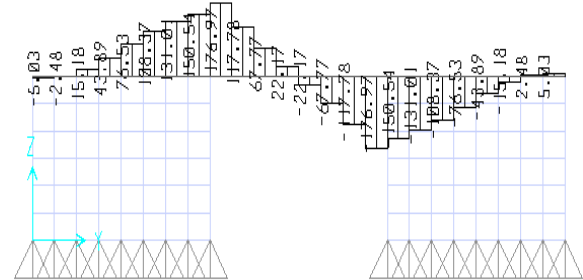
Axial forces in beam in system 8 due to horizontal loads at gridline 1
